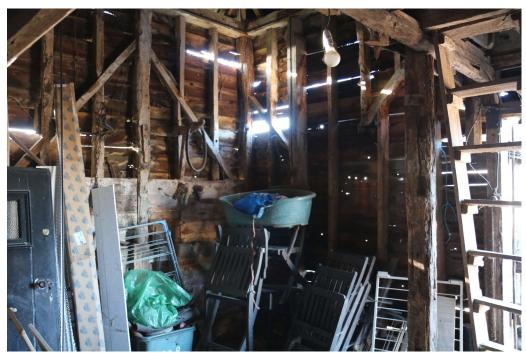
Detail of roof construction of four-bay building A. Photograph taken facing south-west.
